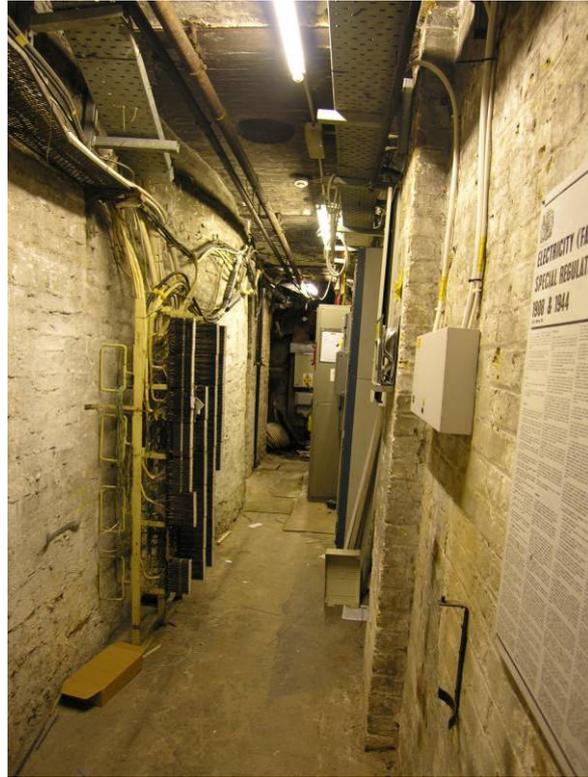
The lower ground floor, beneath the Blomfield Street entrance hall looking west
